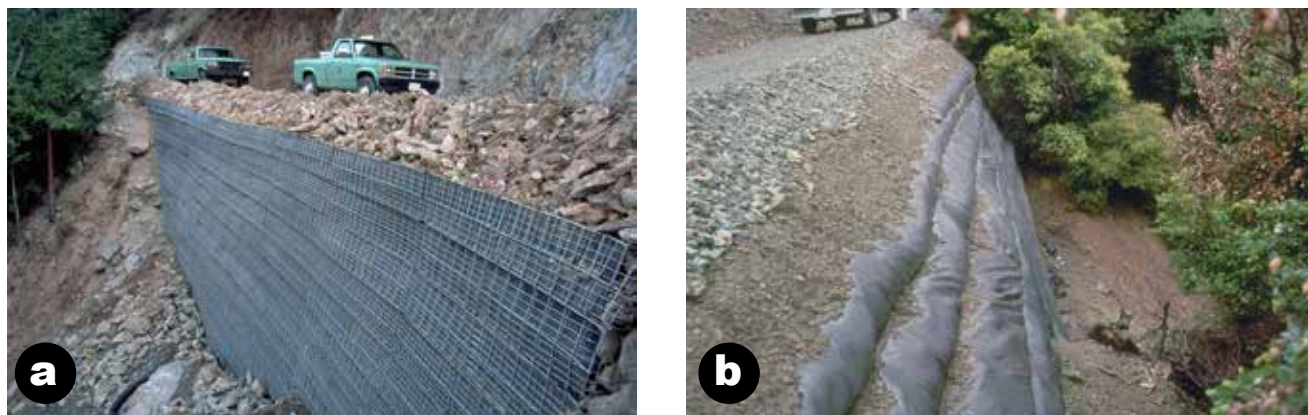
A welded wire MSE wall (a) and a geotextile wall (b), both used because of their relatively low cost and ease of construction.
